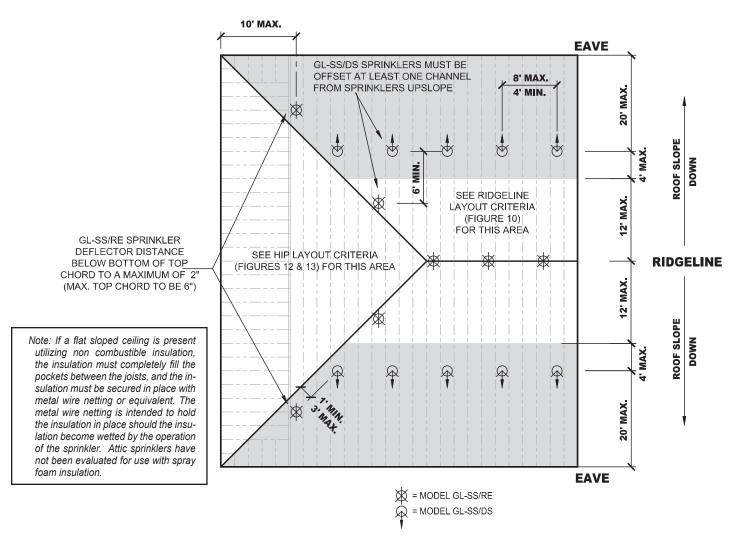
DOWNSLOPE LAYOUT CRITERIA
